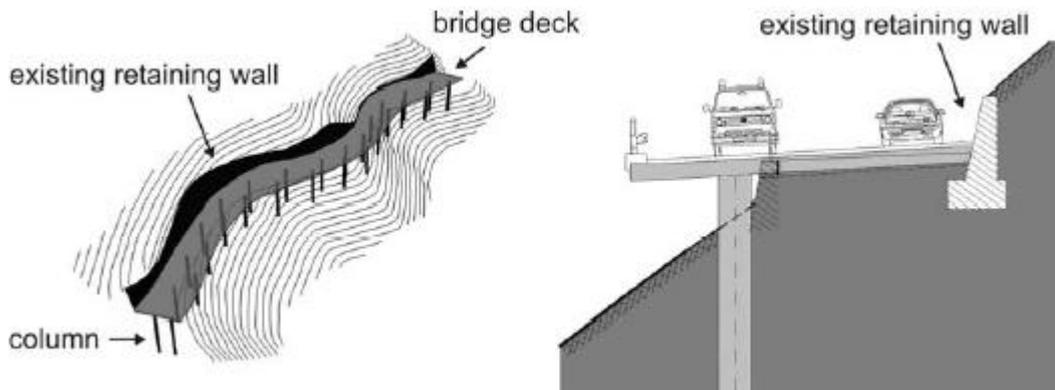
New bridge construction for the widening of roads in steep terrain, (Högler & Lienhart 2003)
